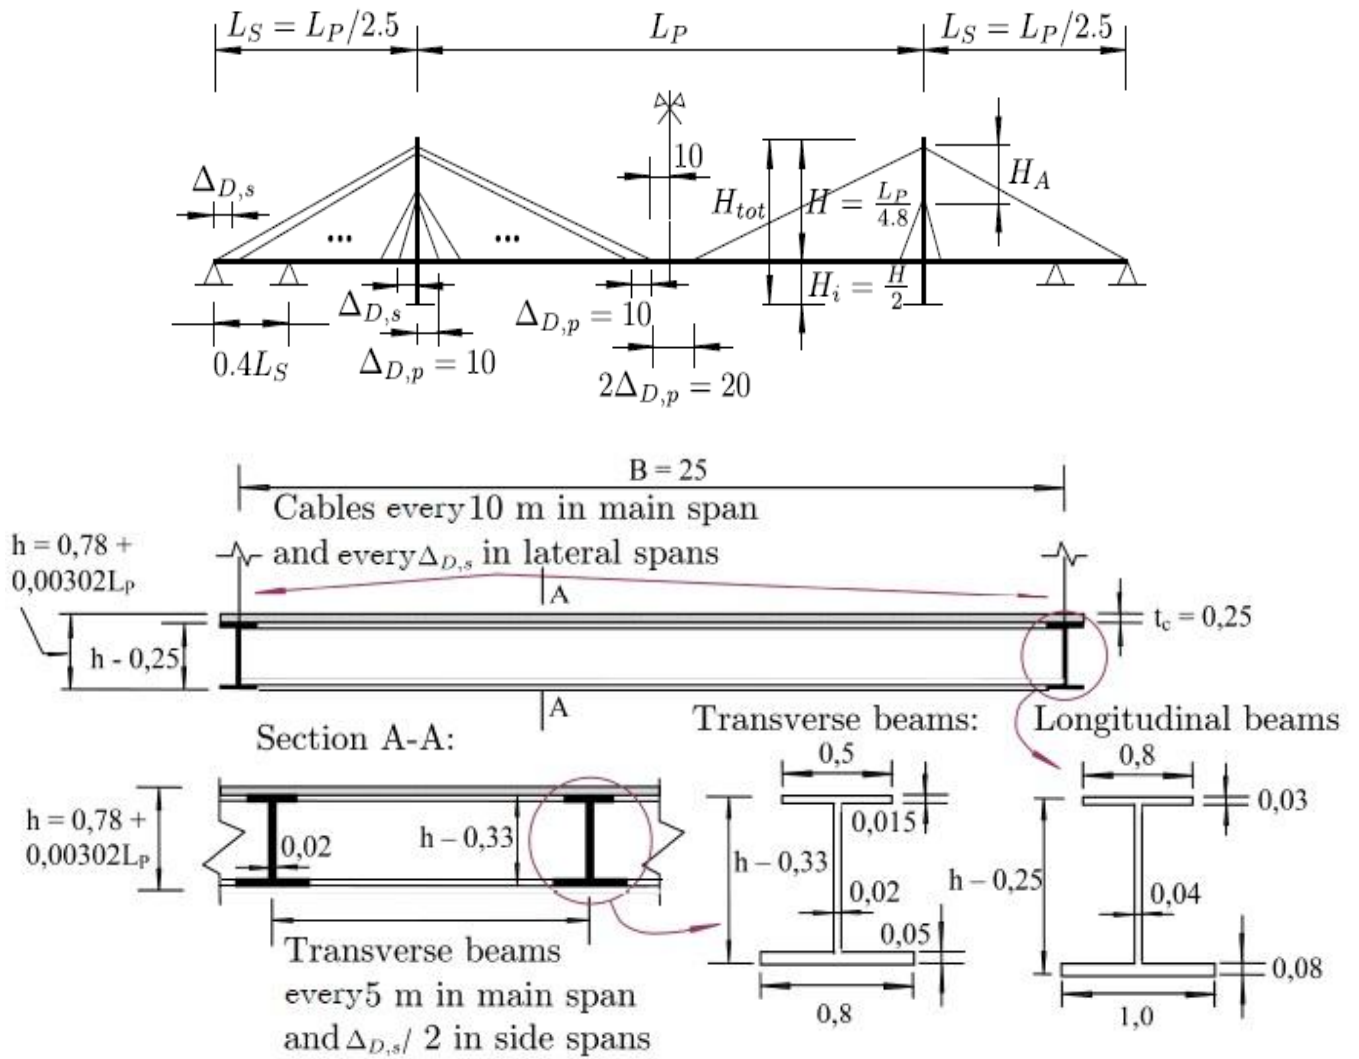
Schematic bridge elevation and plan with the support conditions, in addition to the composite deck cross sections employed in lateral (LCP) cable plane configuration. Measurement in meter
